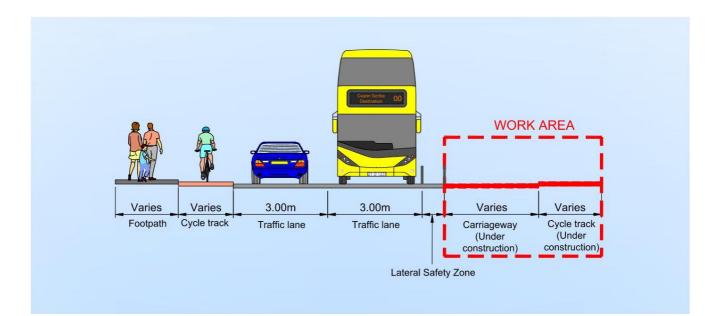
Traffic Management Cross Section, Section 1a – Stage 1
